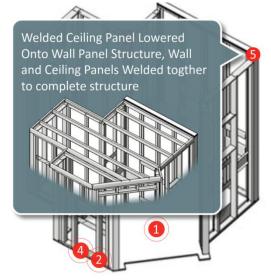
Ceiling Structure Detail | Courtesy of Ameripod Website
